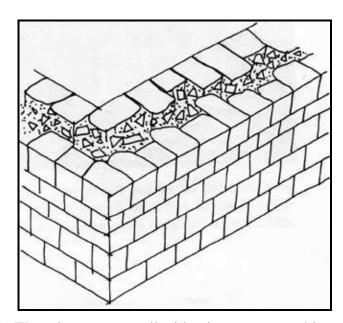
Three-layer stone wall with pierrotage or en blocage fill (ibid: 29).
